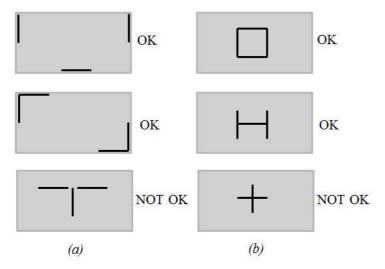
Examples of shear wall arrangements, (a) single walls and (b) composed sections.
